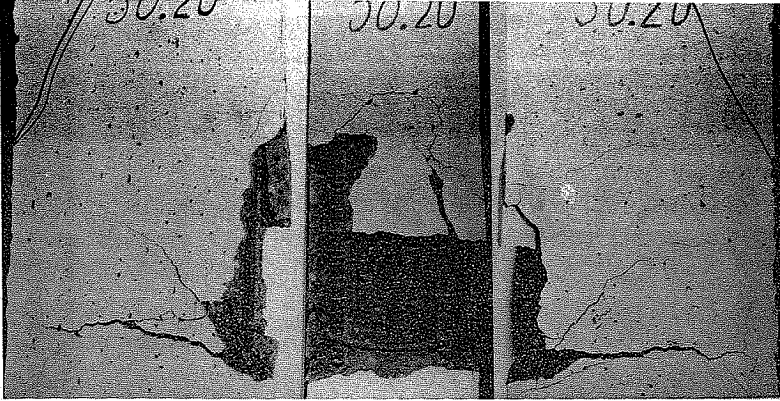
Failure of S.B.-specimen No. 50/20.
